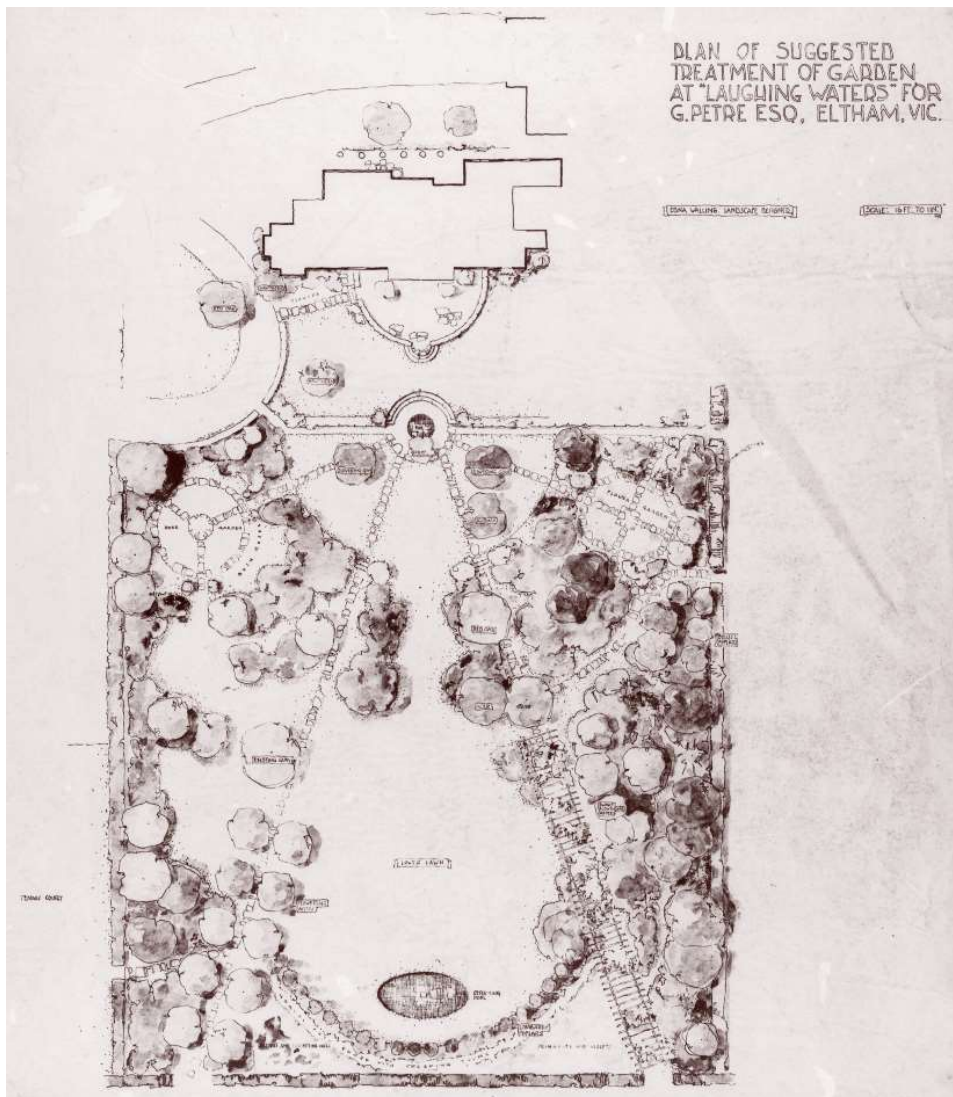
The garden plan prepared by Edna Walling for Laughing Water c1930s. Source: Walling c1930.
